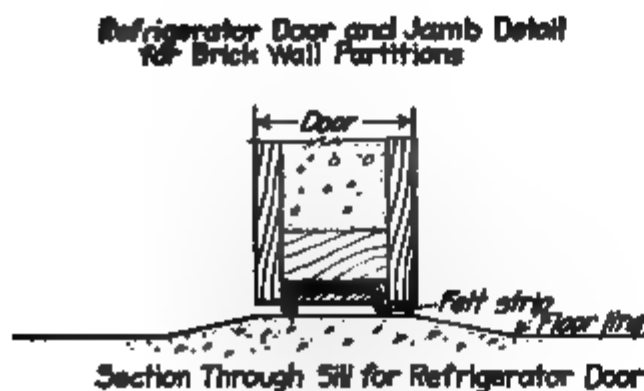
Details of refrigerator doors in cold storage buildings.
